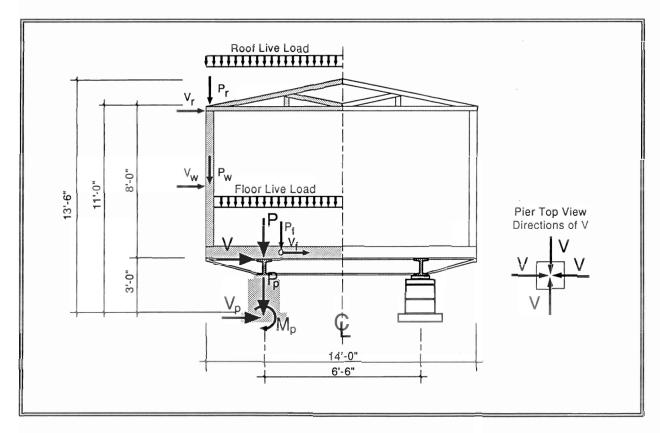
Load Configuration on a Typical Single-wide Section of Manufactured Home
